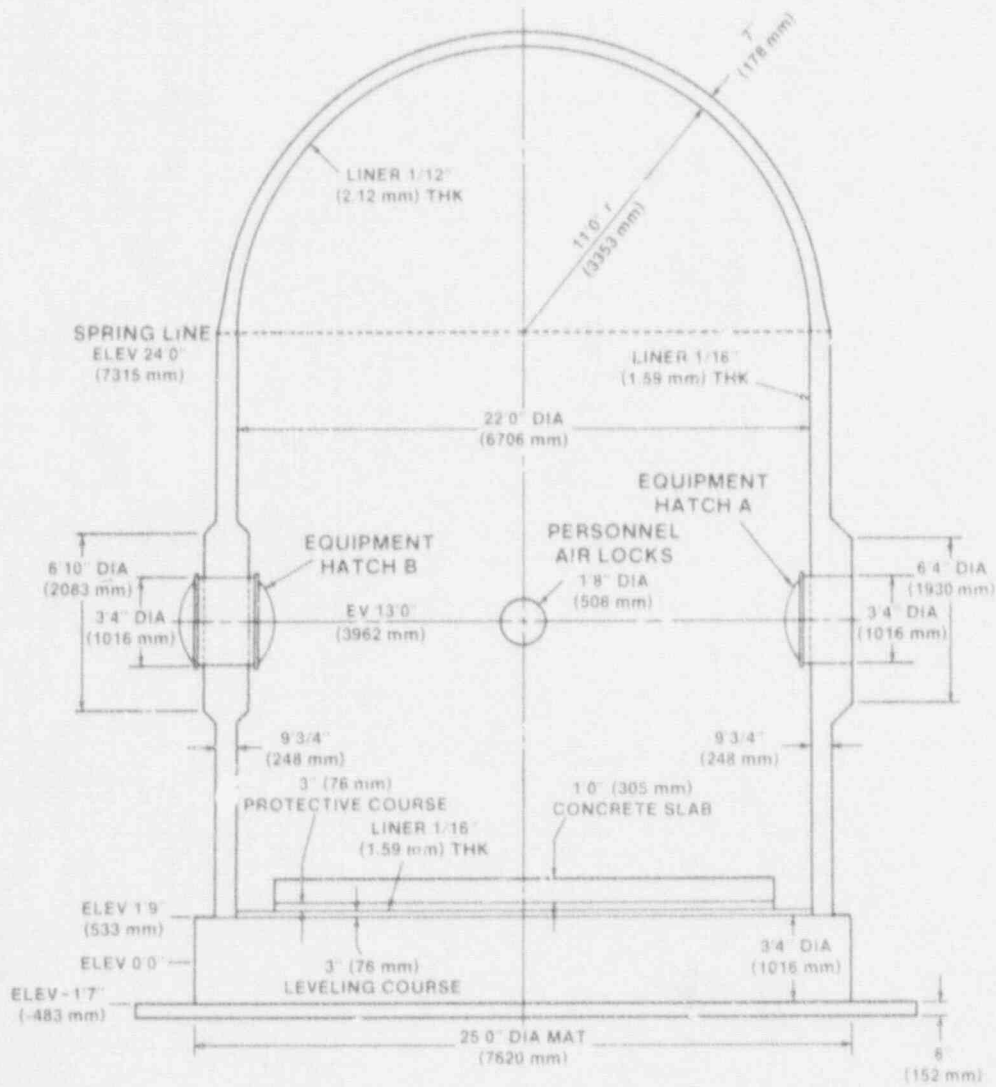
1:6-Scale Reinforced Concrete Containment Model
